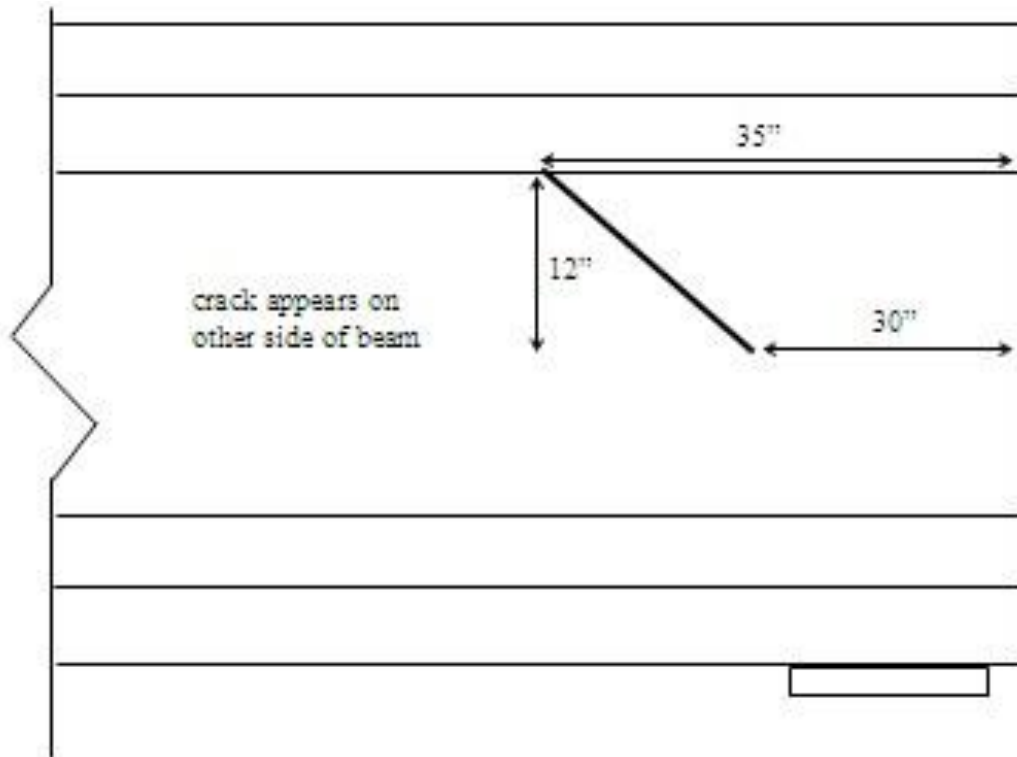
Crack diagram for north span girder, 2nd beam from east side, east face, north abutment (#7933).
